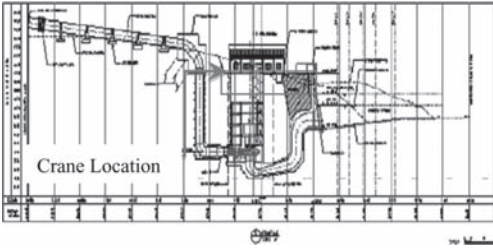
General layout section of the planned extension showing crane location (SMEC, 2011).
